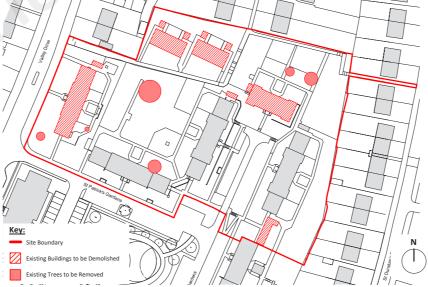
Existing buildings to be demolished and existing trees to be removed (Source: BPTW's Design and Access Statement)
